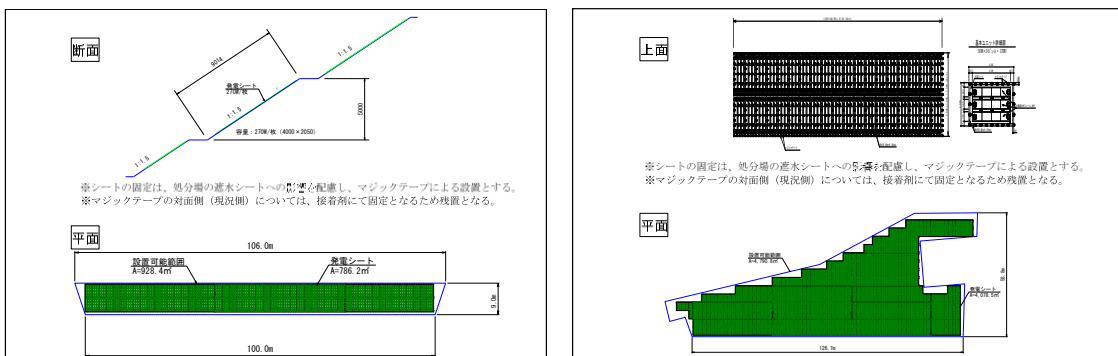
Sheet type module installation drawing (left: slope, right: base)
